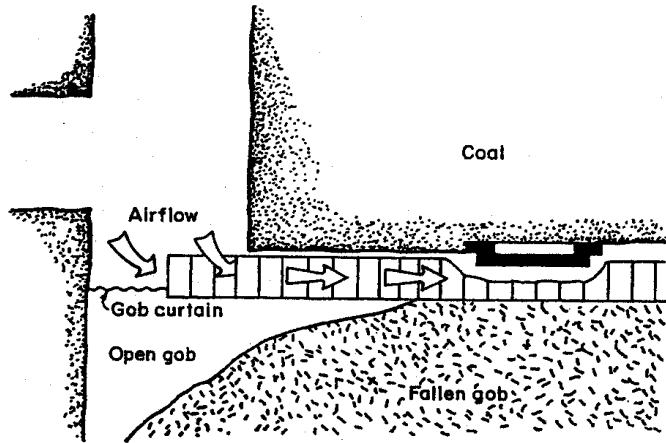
Gob curtain forces air to stay on longwall face
